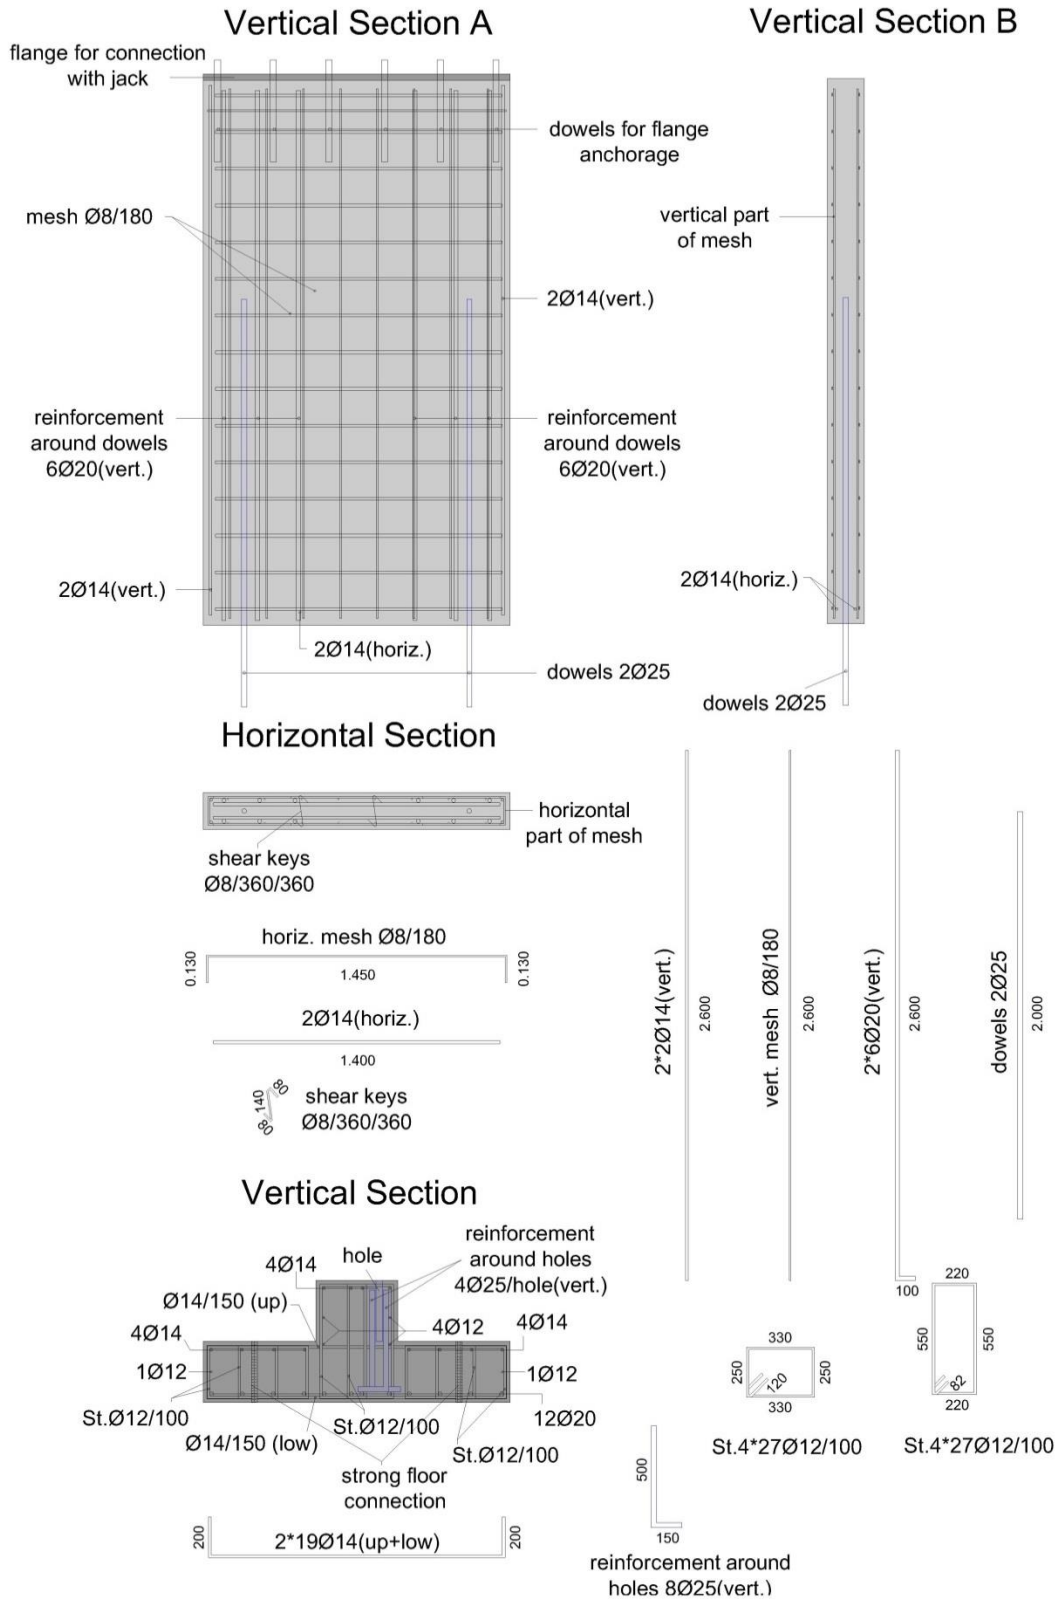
Reinforcement details of specimens 1D25M-R2.
